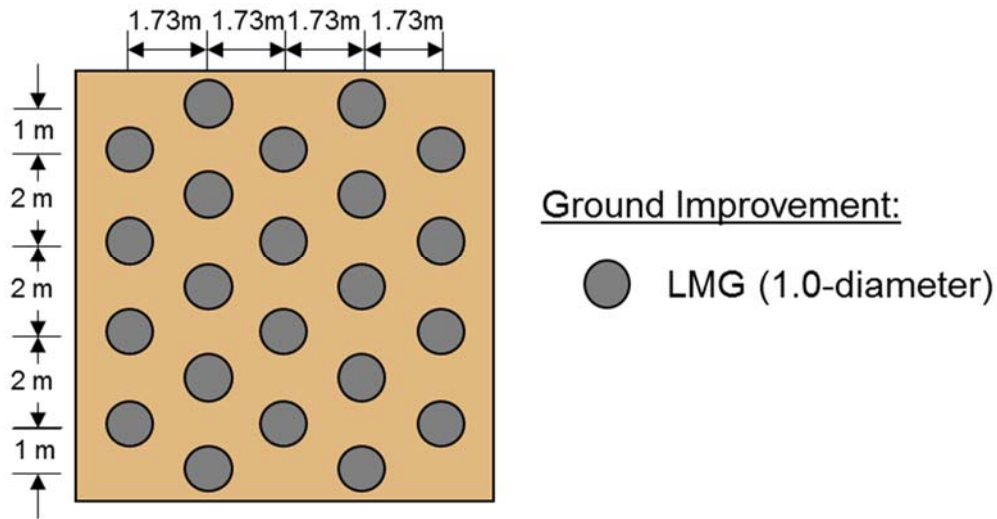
Plan view of the LMG impact points layout used at Sites 3, 4, and 6.
